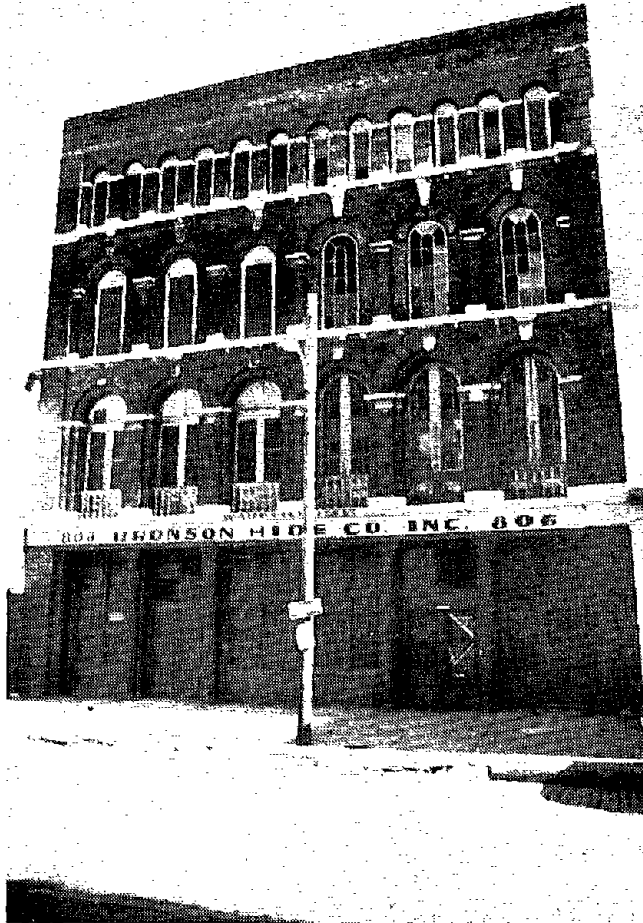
URM COMMERCIAL BUILDING WITH CAST-IRON FRAMING AT STREET LEVEL, ST. LOUIS, MO.
